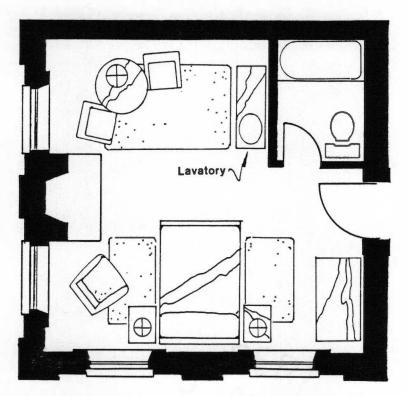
Proposed layout of guest room with case piece lavatory.
